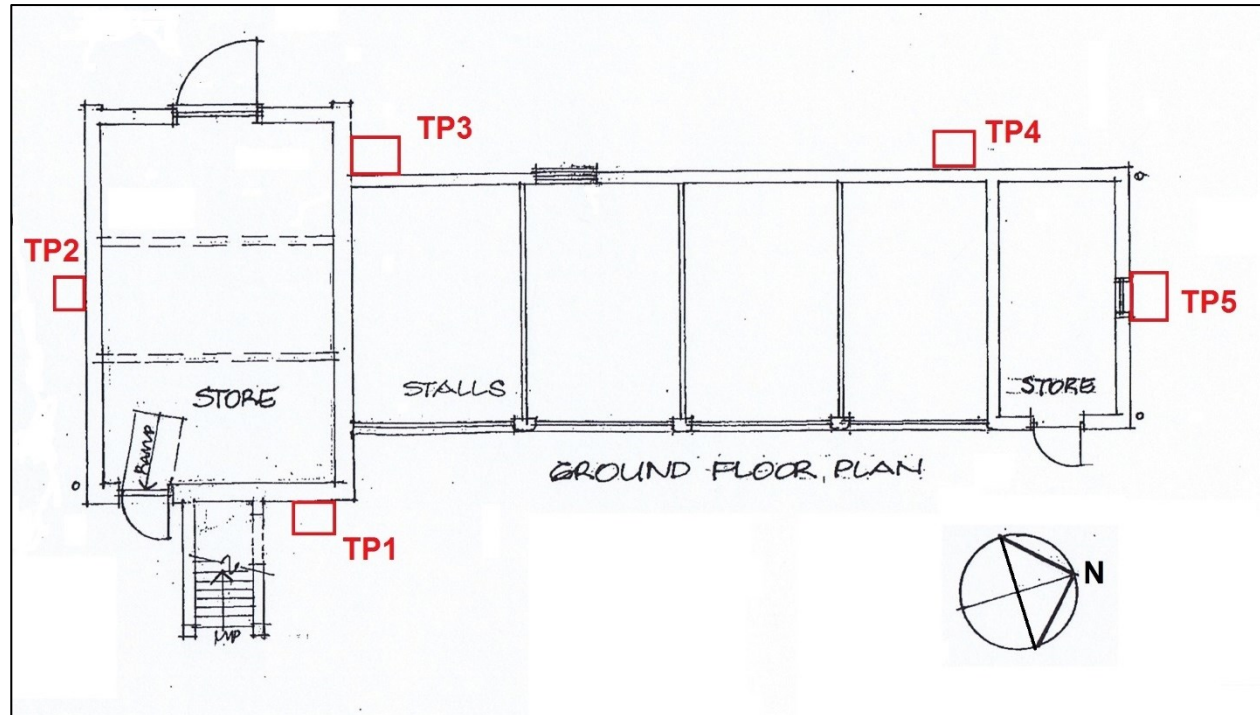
Hayreed Barn, Wilmington: Site and building Plan showing test pit locations
